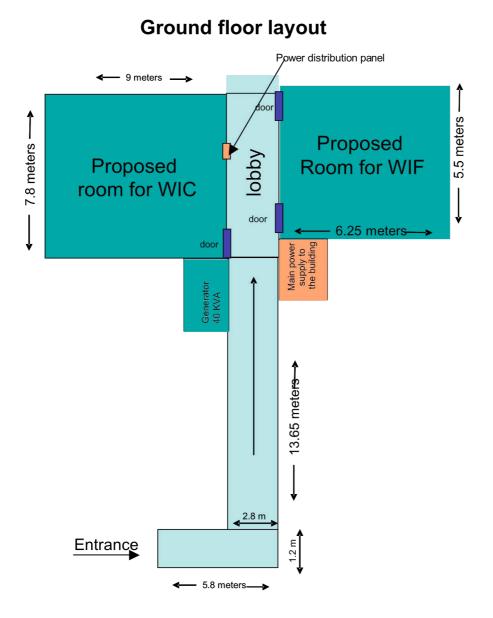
Layout of Meerut cold store facility (ground floor) and suggested locations for the new WIF and WIC
